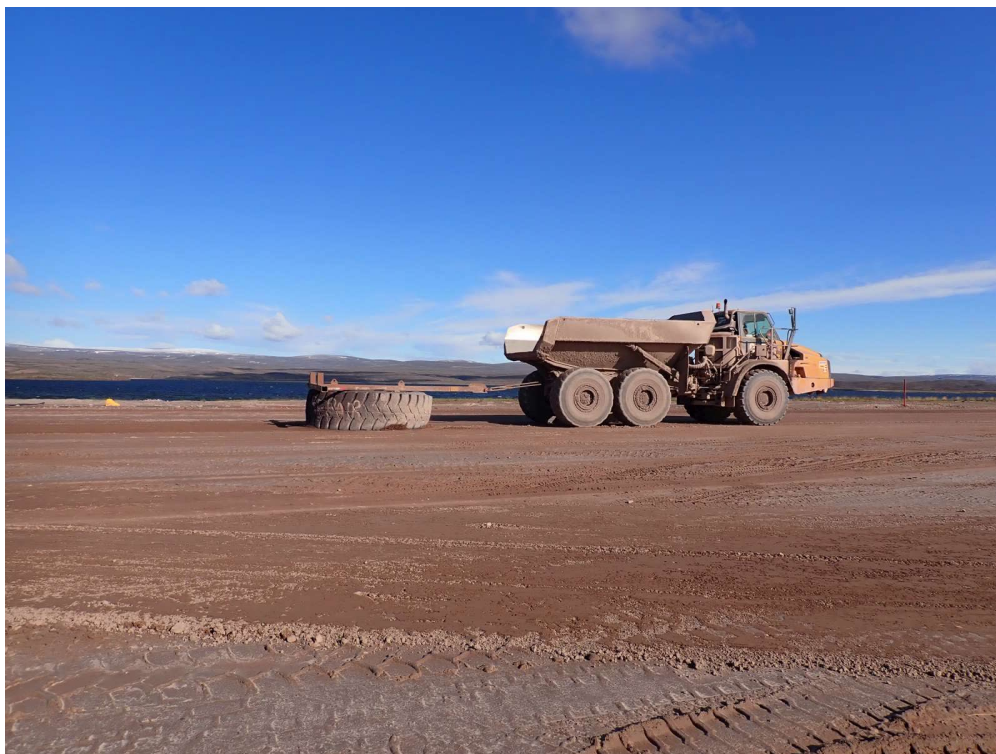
740 Tire Drag at KM 80 on Tote Road – July 2023
